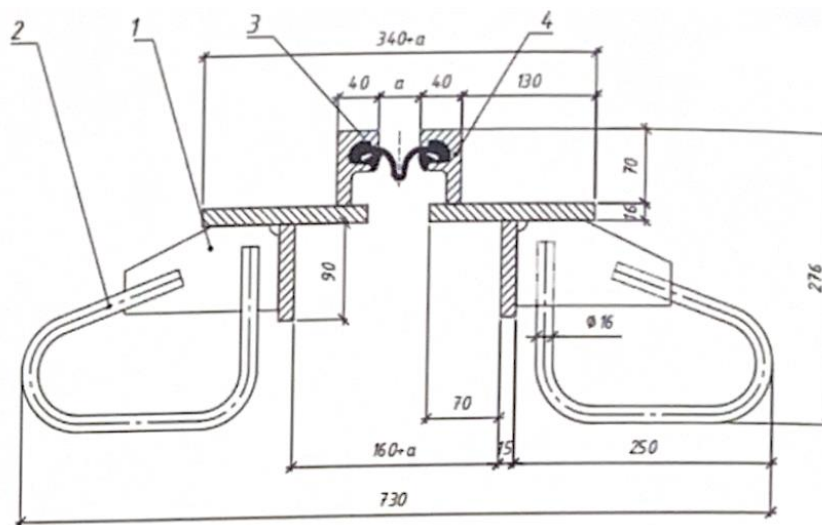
Girder expansion joint OP-DSH-K2 (section) a - opening of DS; 1 - anchor plate; 2 - anchor ring; 3 - compensator; 4 - edging. [the drawings are taken from the website <https://k2-engineering.ru/produktsiya/deformatsionnye-shvy/odnoprofilnye-deformatsionnye-shvy>, edited by Bondar I.S.]
